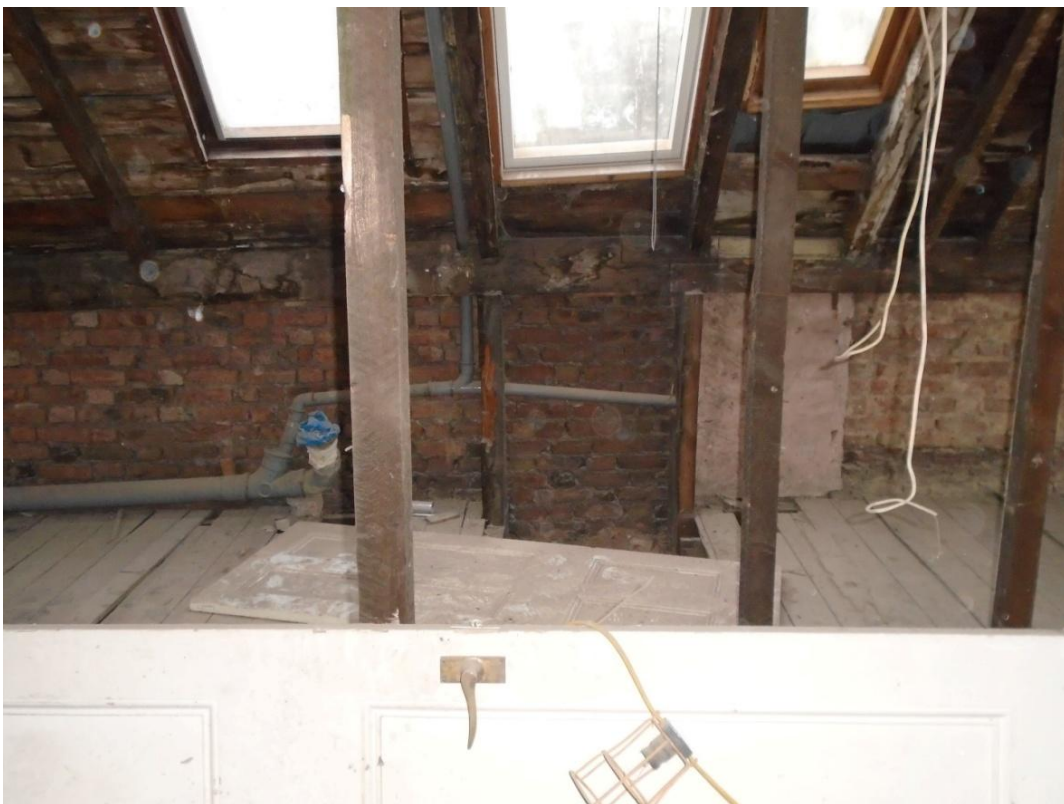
Poor condition of waling beam and inadequate trimming to roof lights
